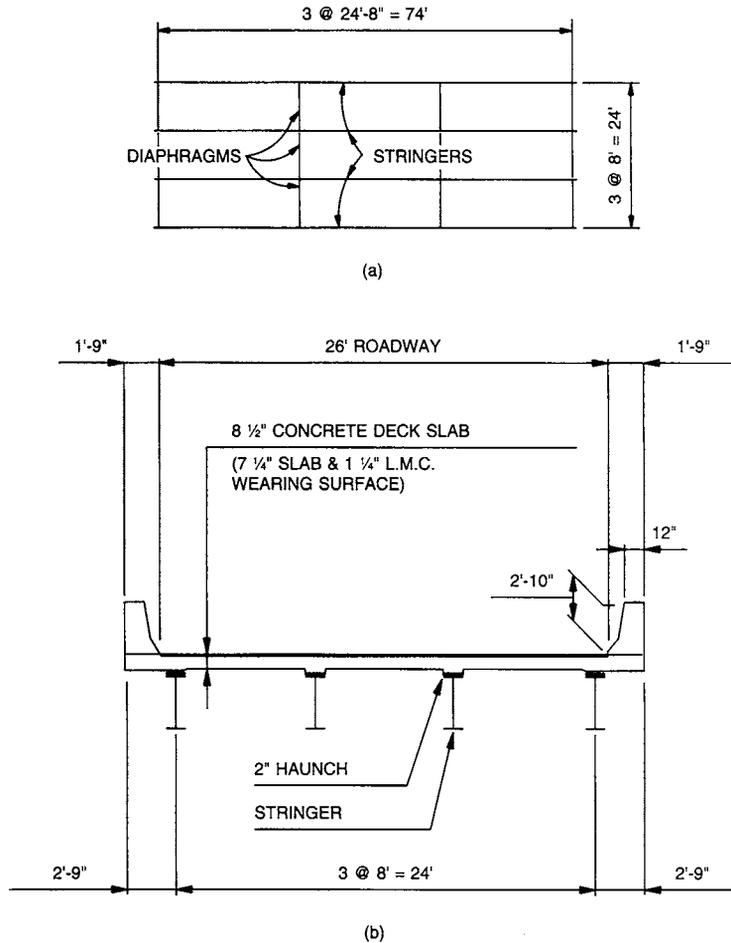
Two-lane highway bridge with rolled-beam stringers. (a) Framing plan. (b) Typical cross section.
